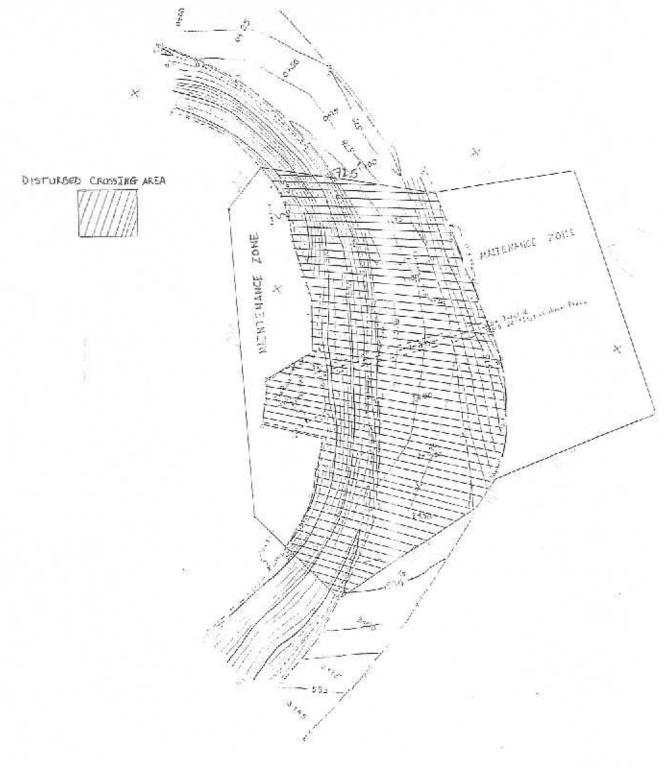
ACCESS ROAD DRAINAGE AREA A
